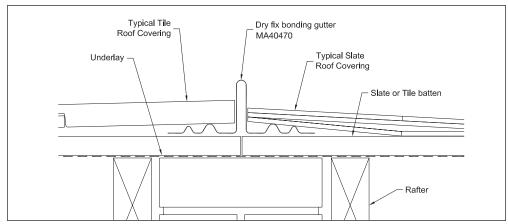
Typical standard installation showing low profiled interlocking tiles abutting slates, using MA40470
